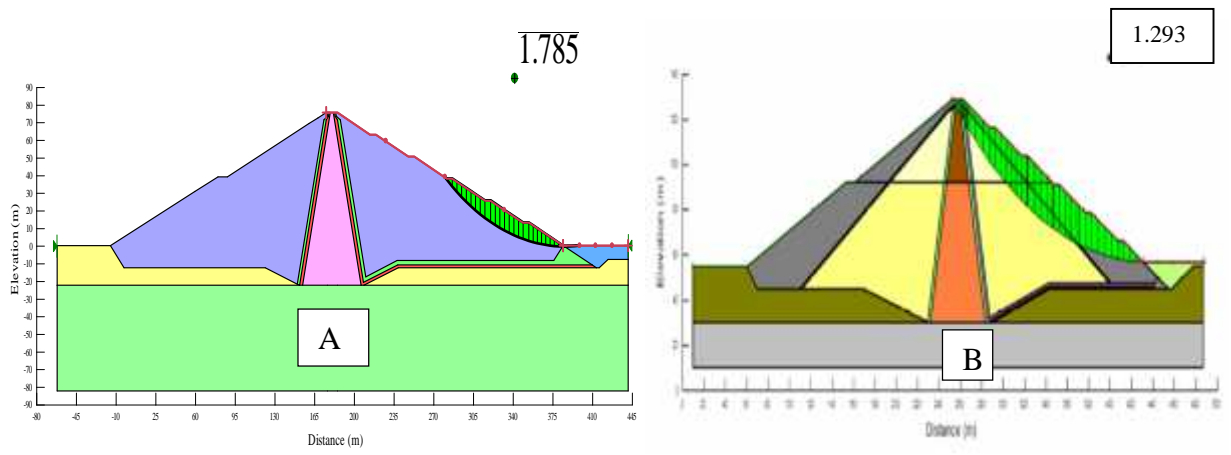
Minimum factor of safety of (A) revised section and (B) original design during second stage construction
